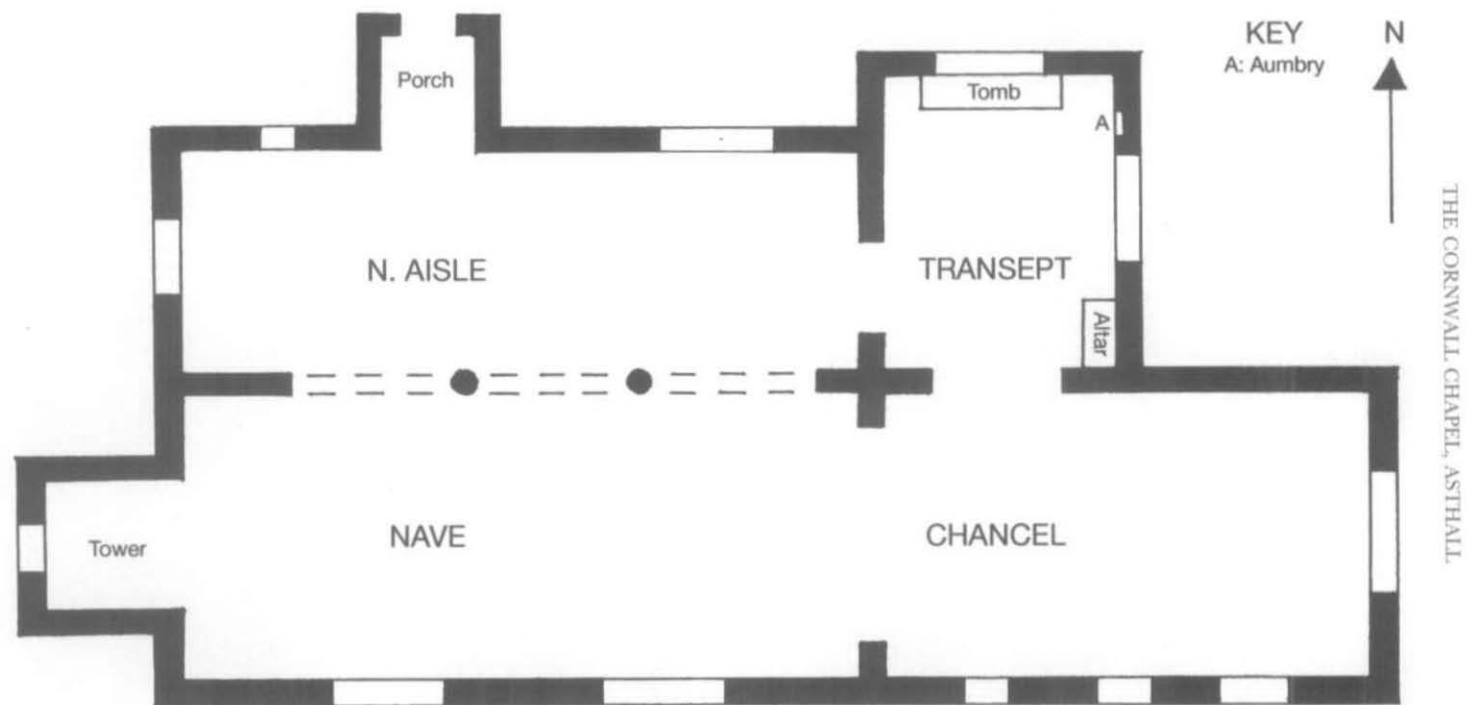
St. Nicholas Church, Asthall: ground plan (not to scale).
